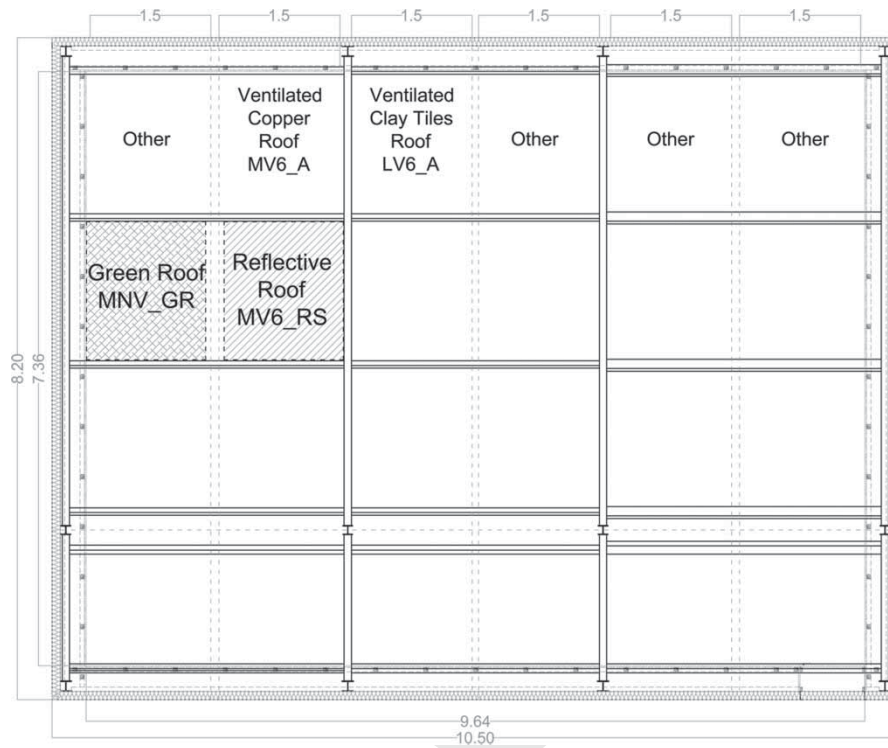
Plan of the experimental building with the schematic position of the original roofs installed in the building (ventilated clay tiles and copper roofs) and the high-albedo roofs (green roof and roof with a reflective covering) installed in 2011.
